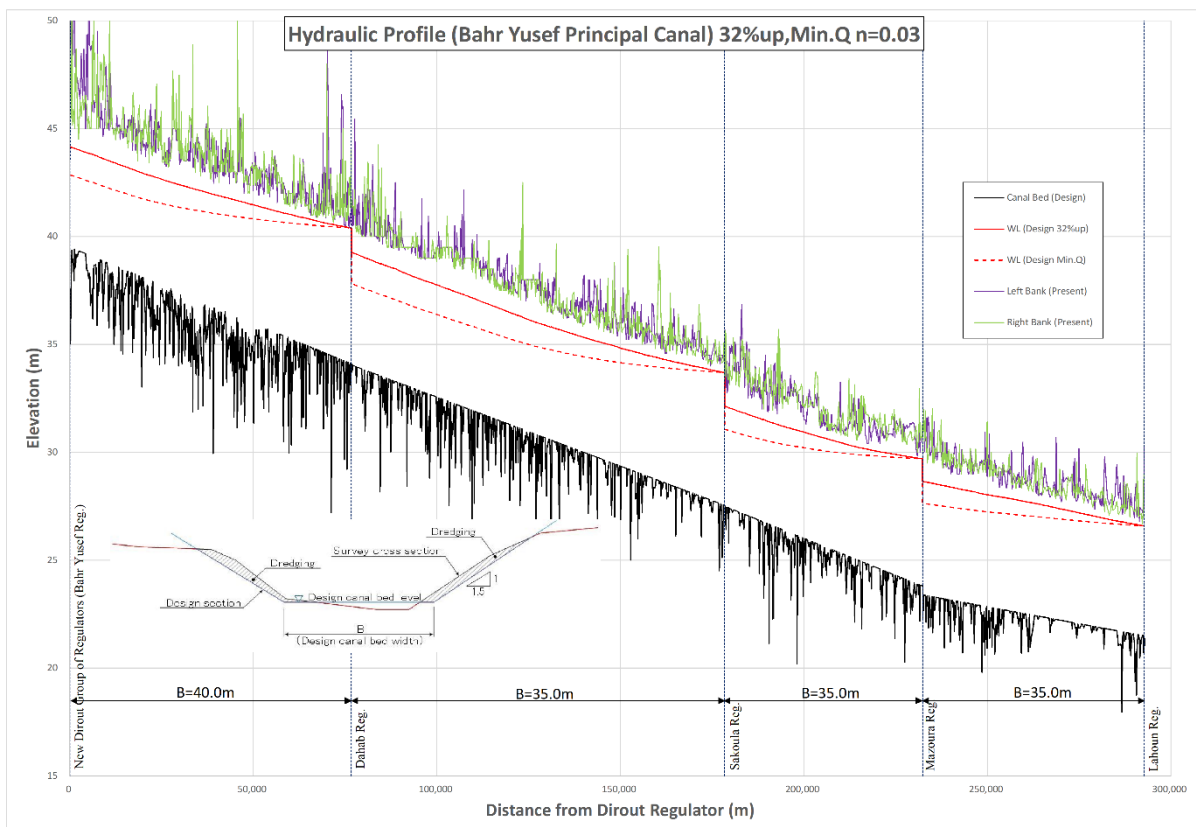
Hydraulic Longitudinal Profile of Bahr Yusef Principal Canal (Maintenance Plan: 32% up & Min.Q)
